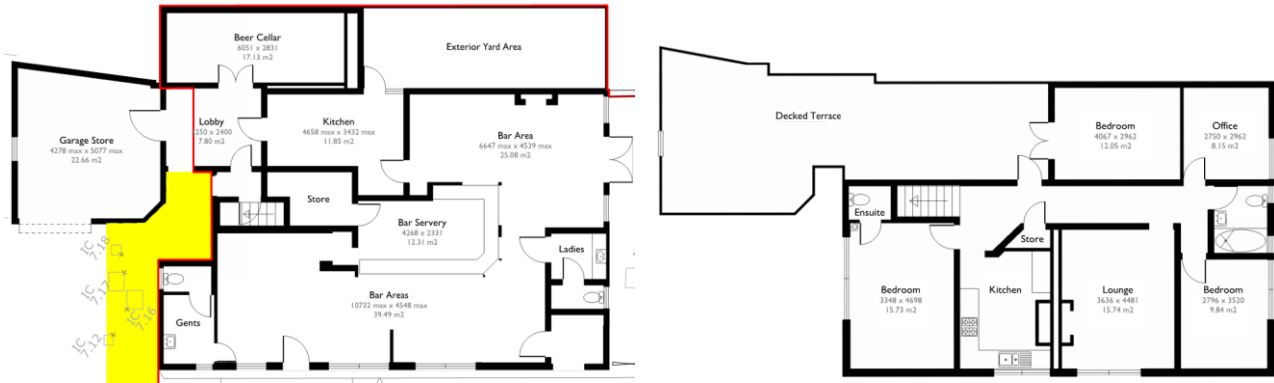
Existing Ground floor (left) and First floor (right) arrangements
